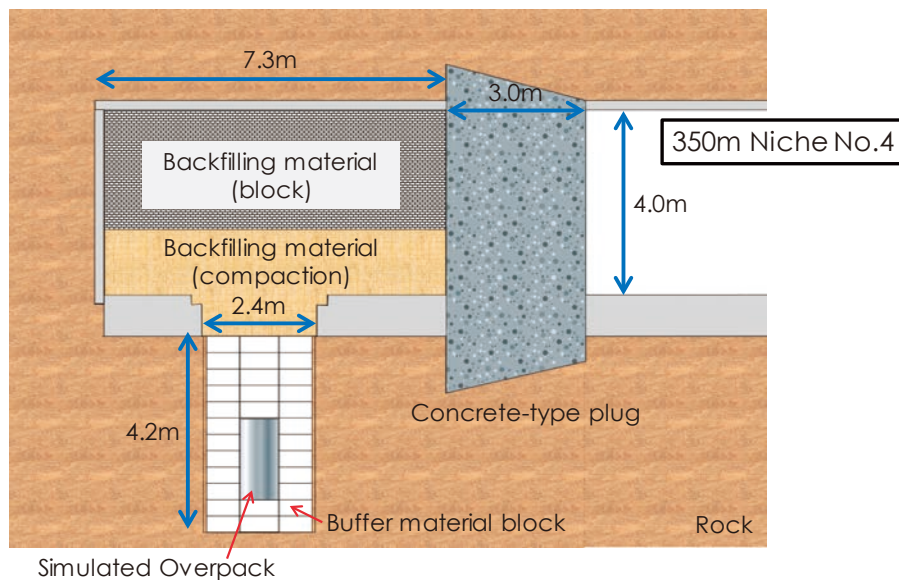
Schematic cross-section view of test pit at Niche No.4
